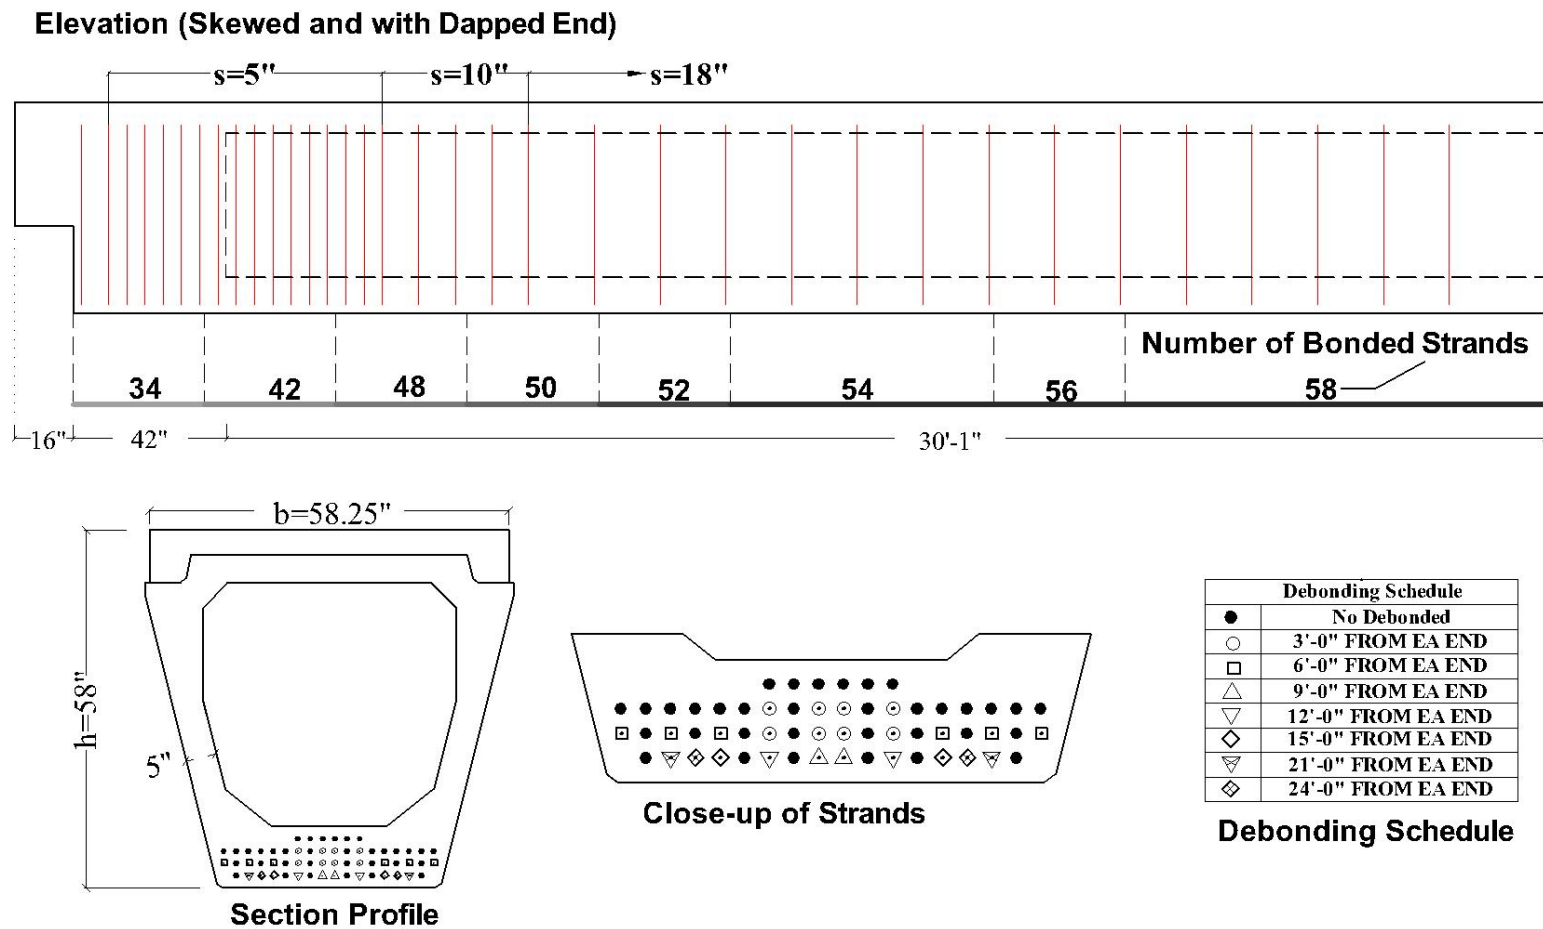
Layout of transverse reinforcement and prestressing strands (MLL-9-34-A)
